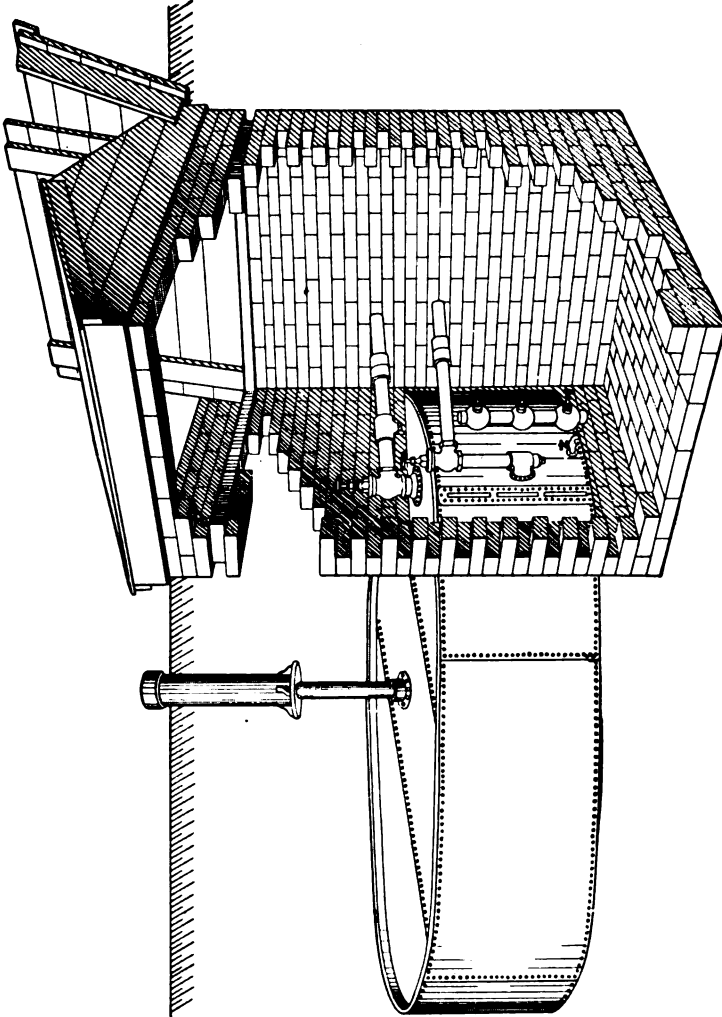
Carburettor with Flt Giving Access to Transfer Cocks. Pump Pipes, etc.
